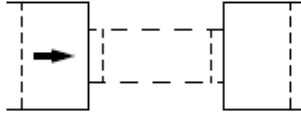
Top view of a bridge showing the cross sections of interest. Only two piers are depicted for simplicity.
